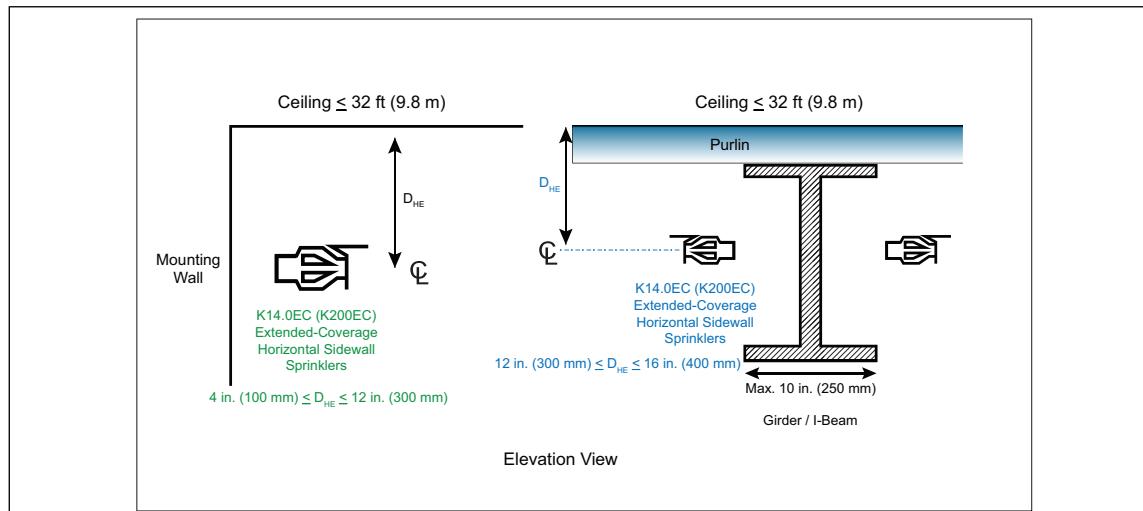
Vertical location of Nonstorage K14.0EC (K200EC) horizontal sidewall sprinklers below ceiling
